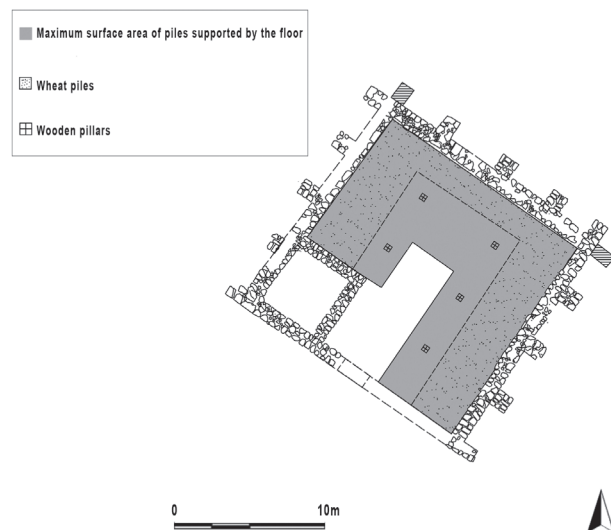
Surface area available for piles of wheat avoiding the roof pillars. In grey, the maximum total surface area that the flooring could support (safe load) (drawing F. Martorella).
